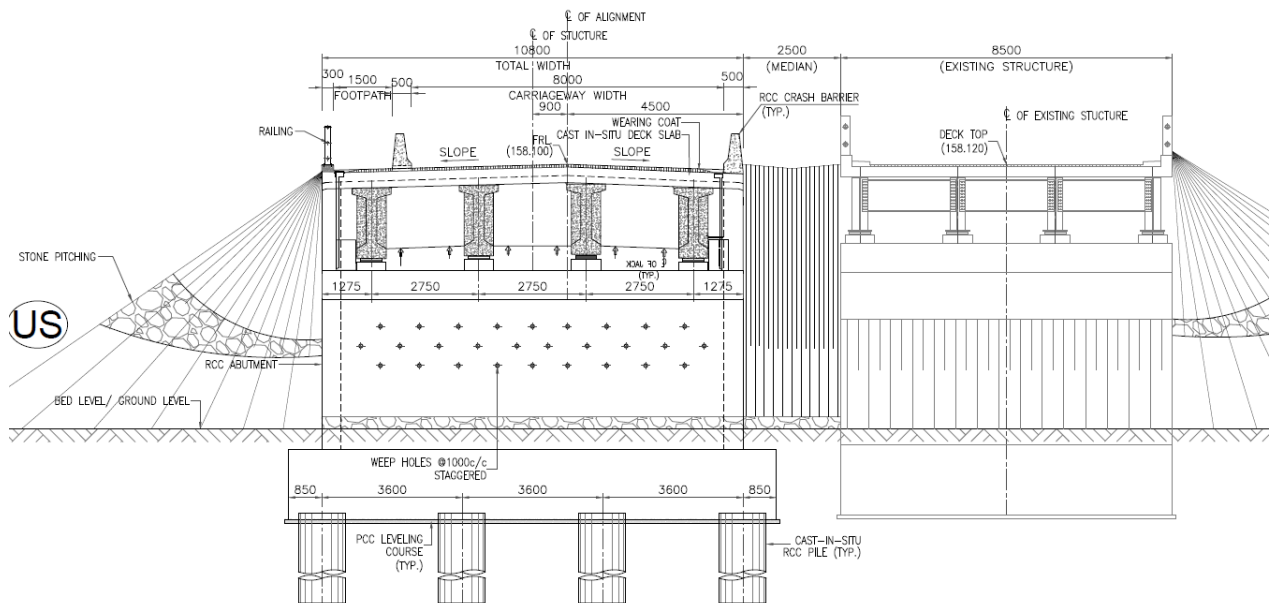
Cross-Sections of Houay Xambounnyai Bridge
